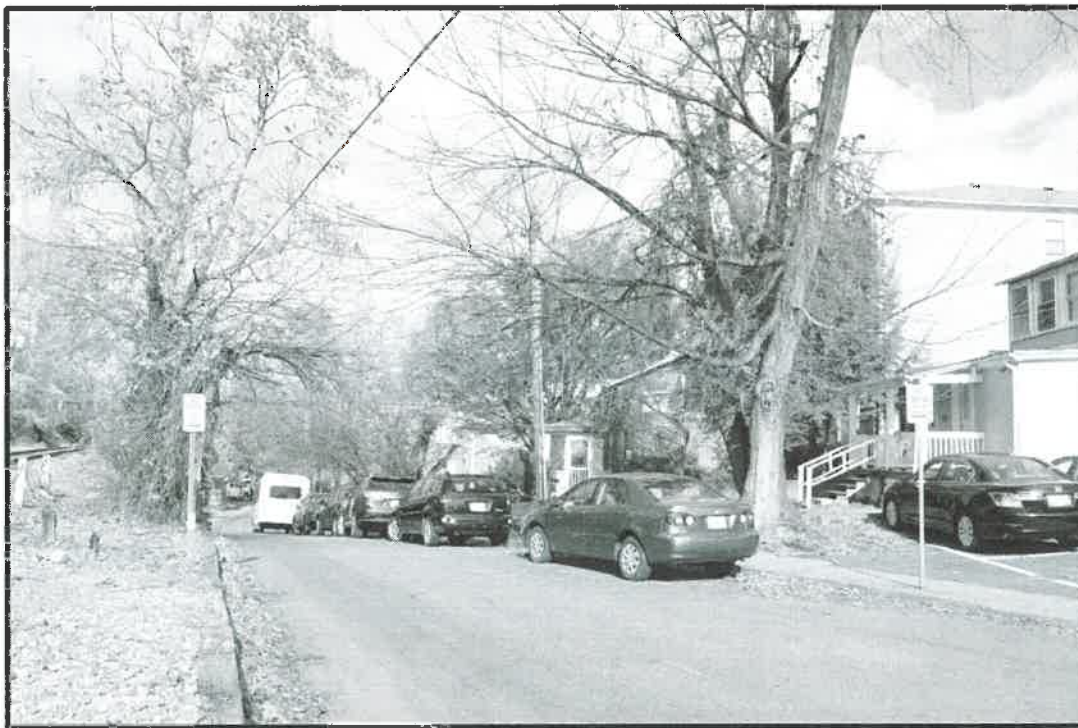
View to Proposed Small Cell Antenna Site from the King-Runkle House (VDHR #104-0248), Looking North (Not Visible).
